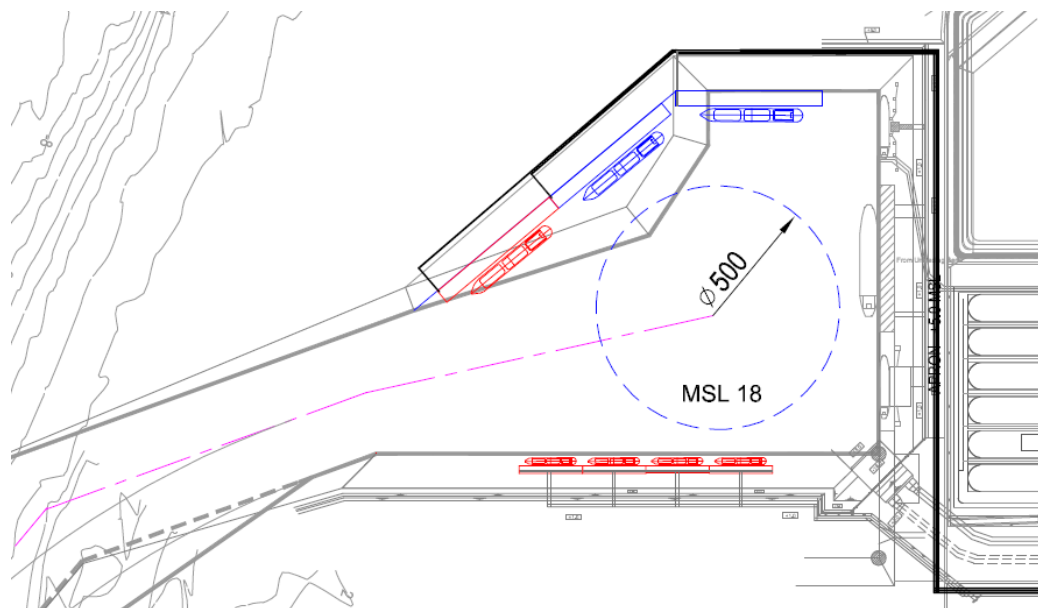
Layout Plan of Coal Loading Berth in the 2nd Phase
